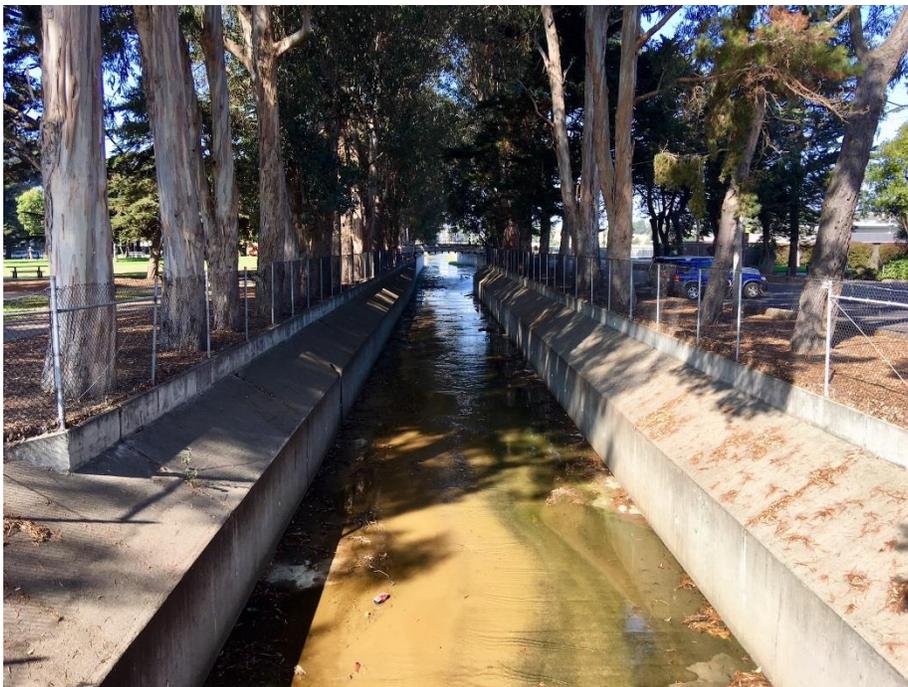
Vegetation growing out of the crack between concrete slabs lining Colma Creek channel.
